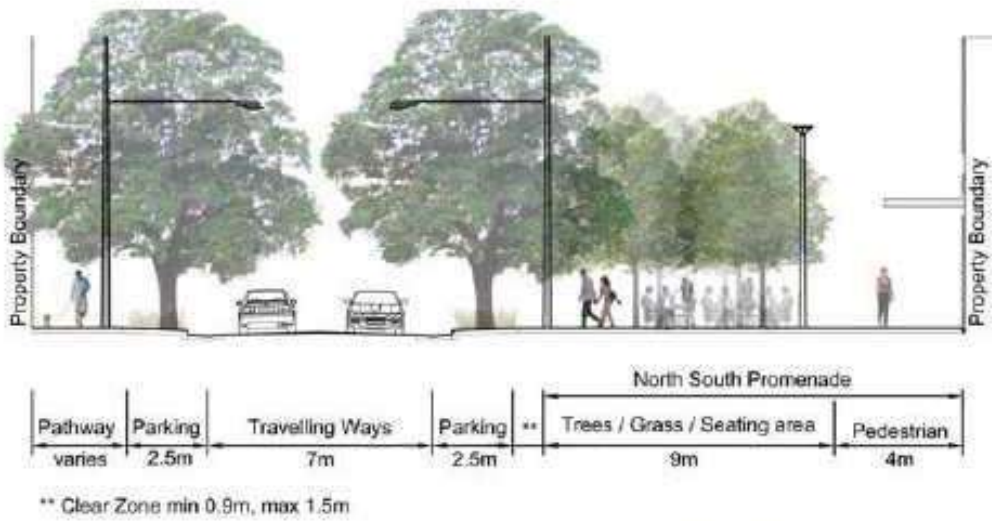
Section E2 – North South Street and Promenade Multiuse Zones
